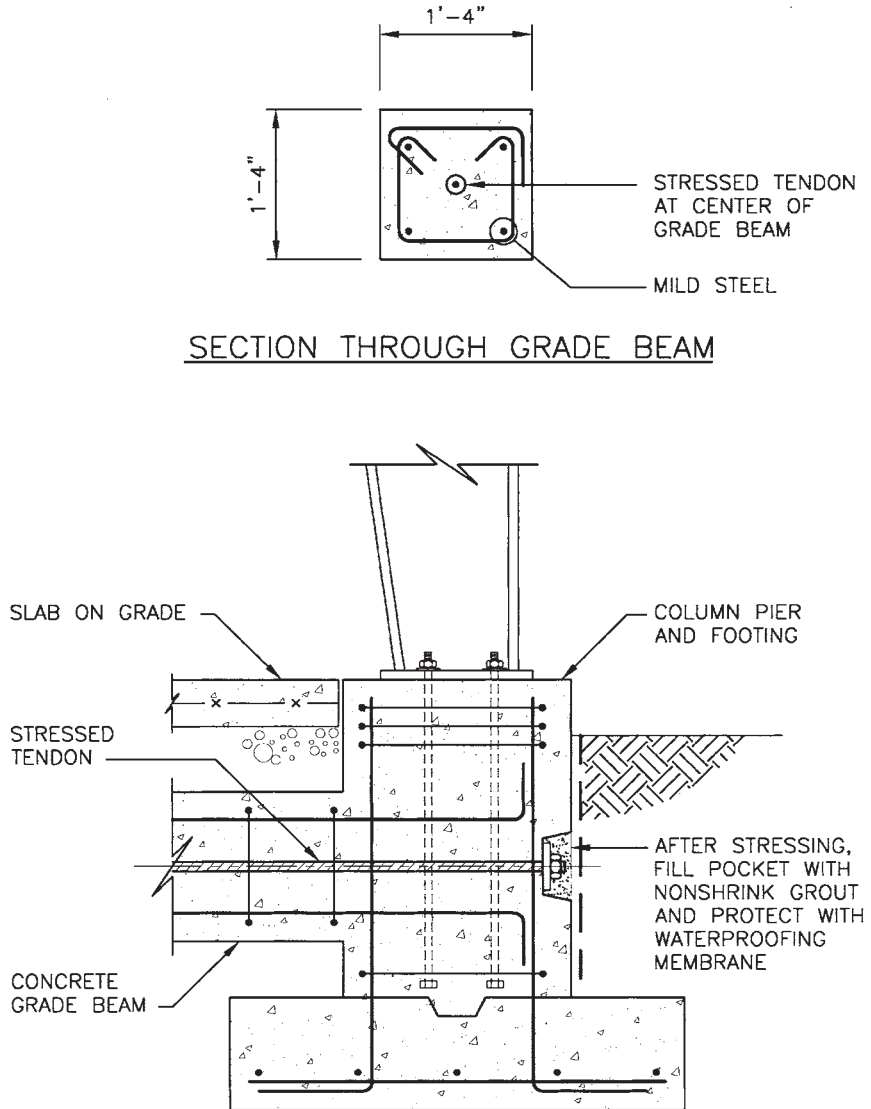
Post-tensioned tie rod encased in concrete beam.
